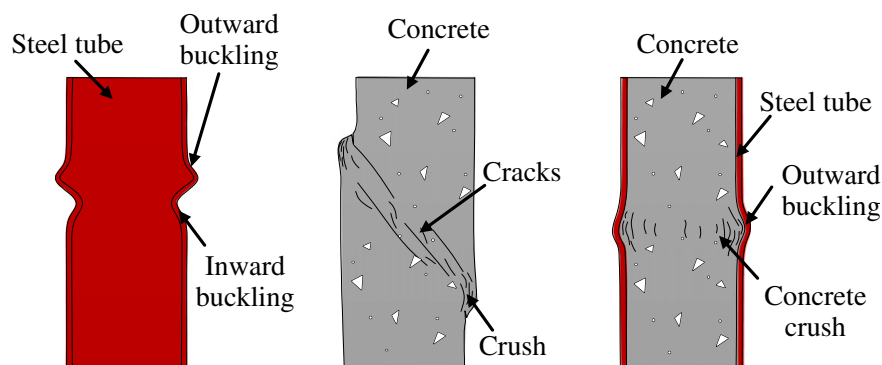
Schematic failure modes of hollow steel tube, concrete and CFDST stub columns.
